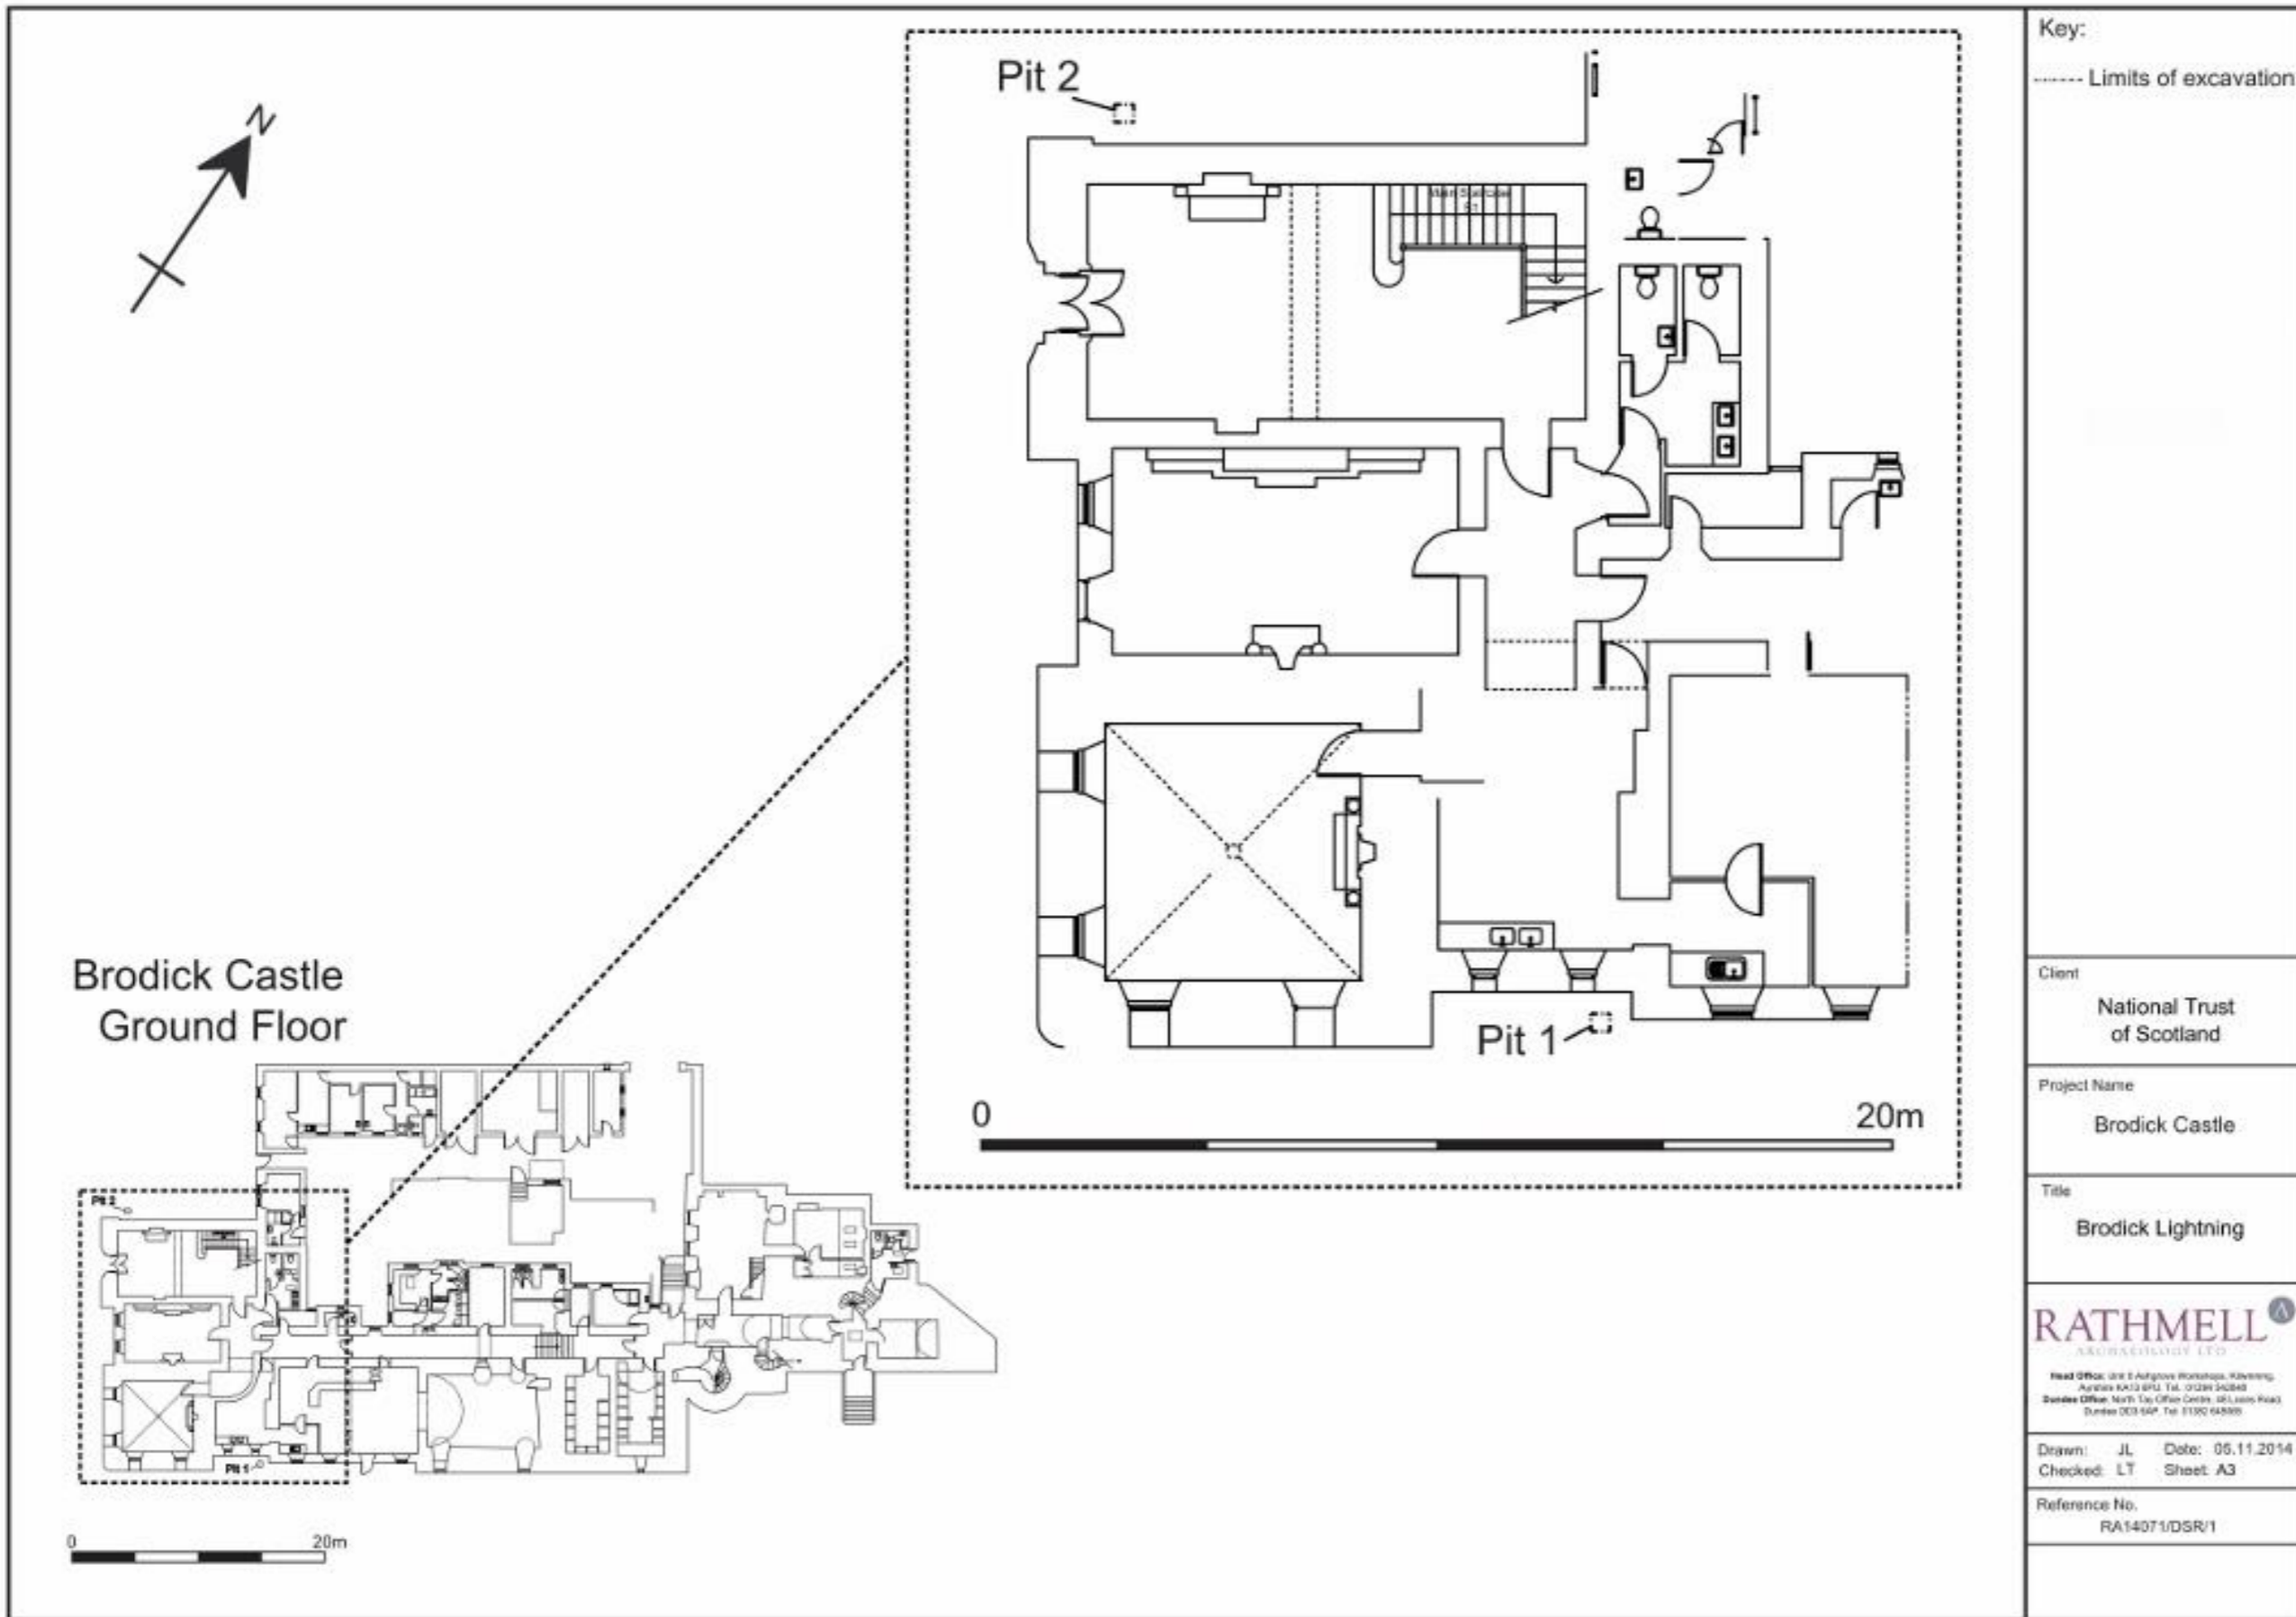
Plan Showing Location of Pits for Installation of Lightning Conductor
